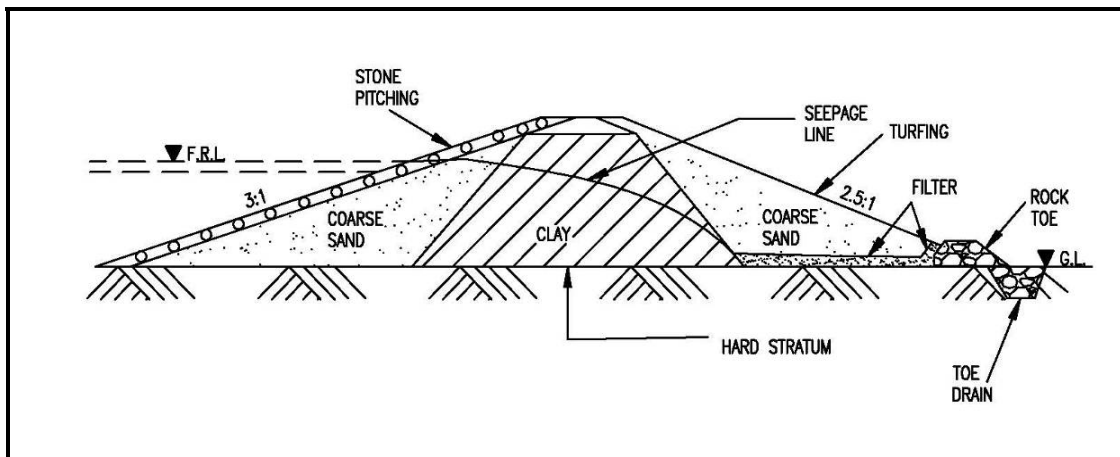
Typical Earth Dam Section with Coarse Sand Material
